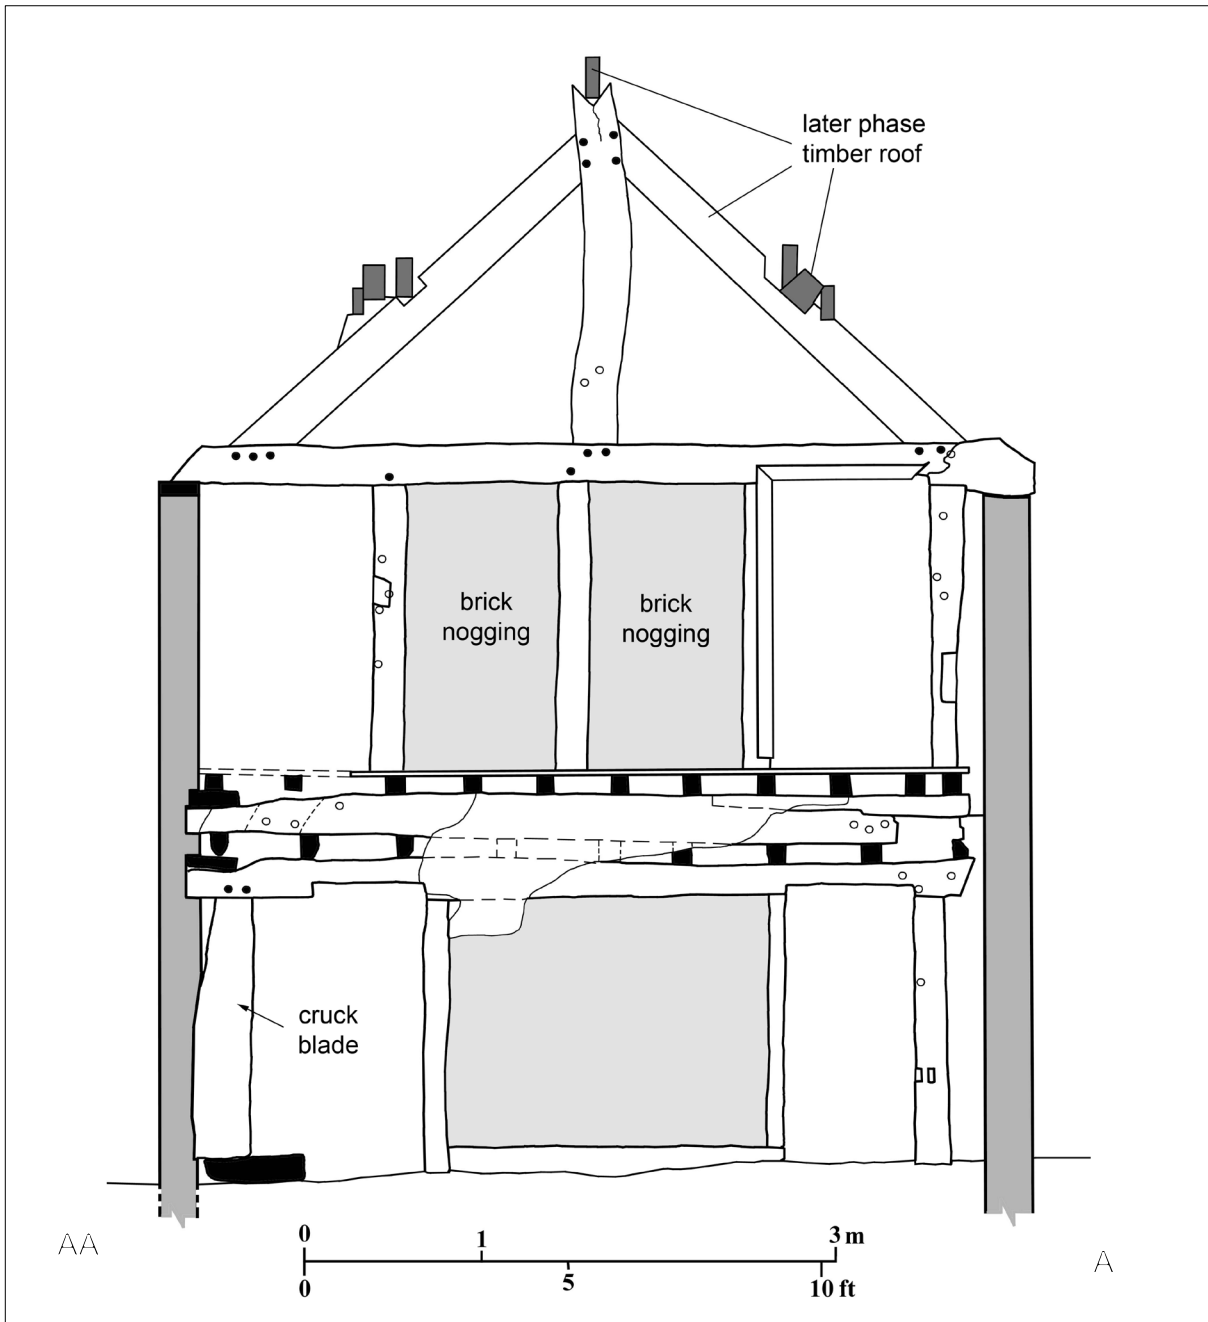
Onion Farmhouse cross-section through the cruck truss and wall painting wall (A-AA).
